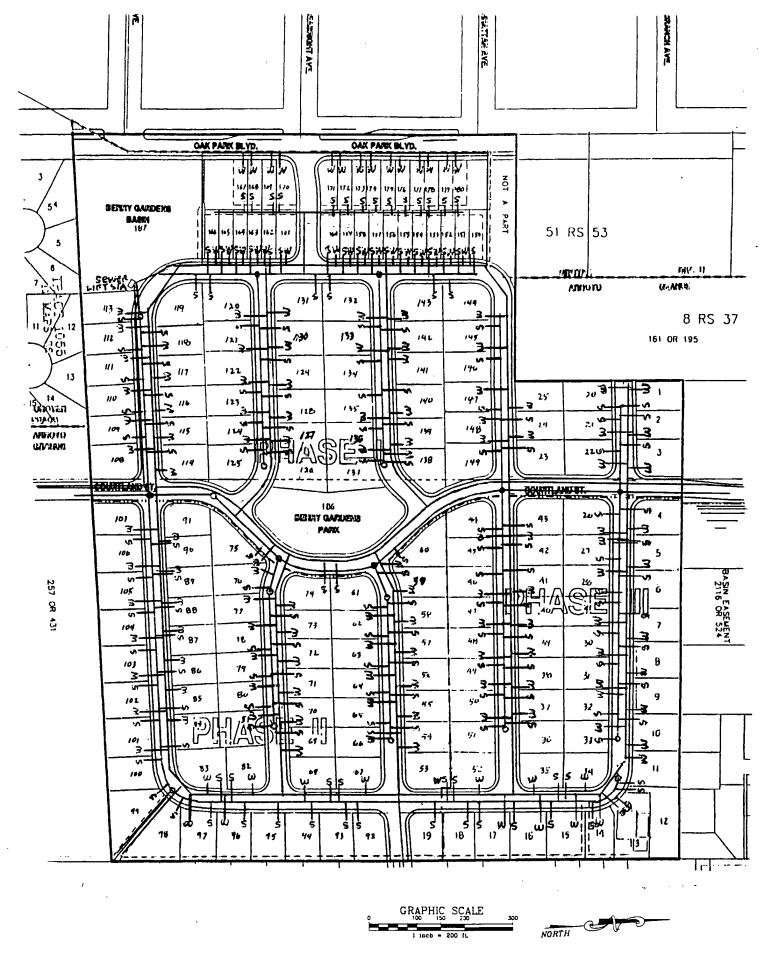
WATER AND SEWER PLAN MAP
